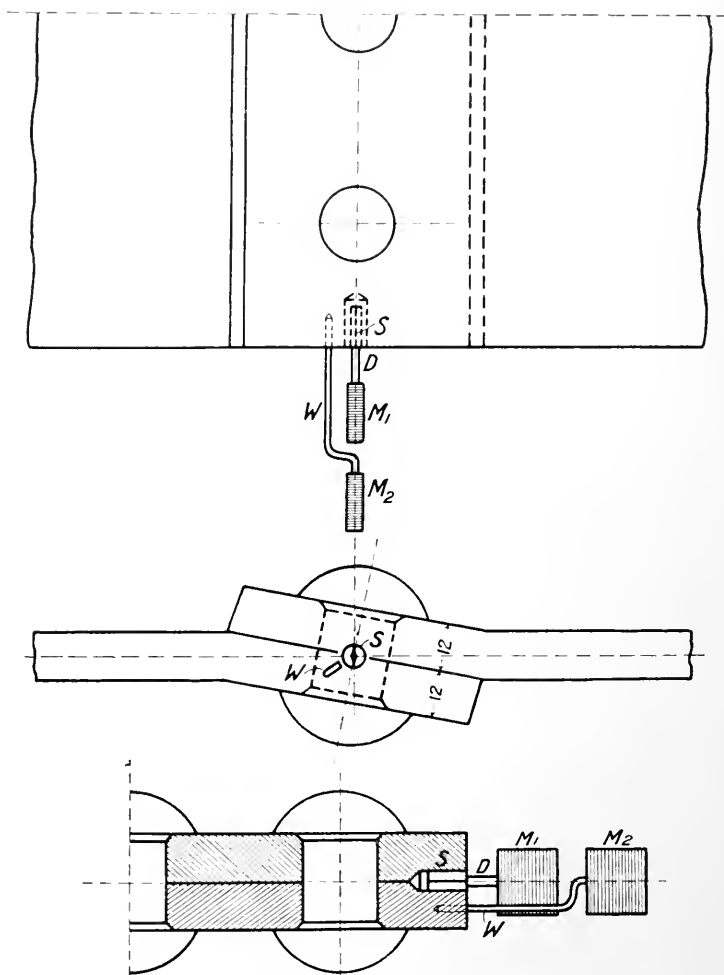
No. 3 Apparatus for Measuring the Slip of Riveted Joints.
